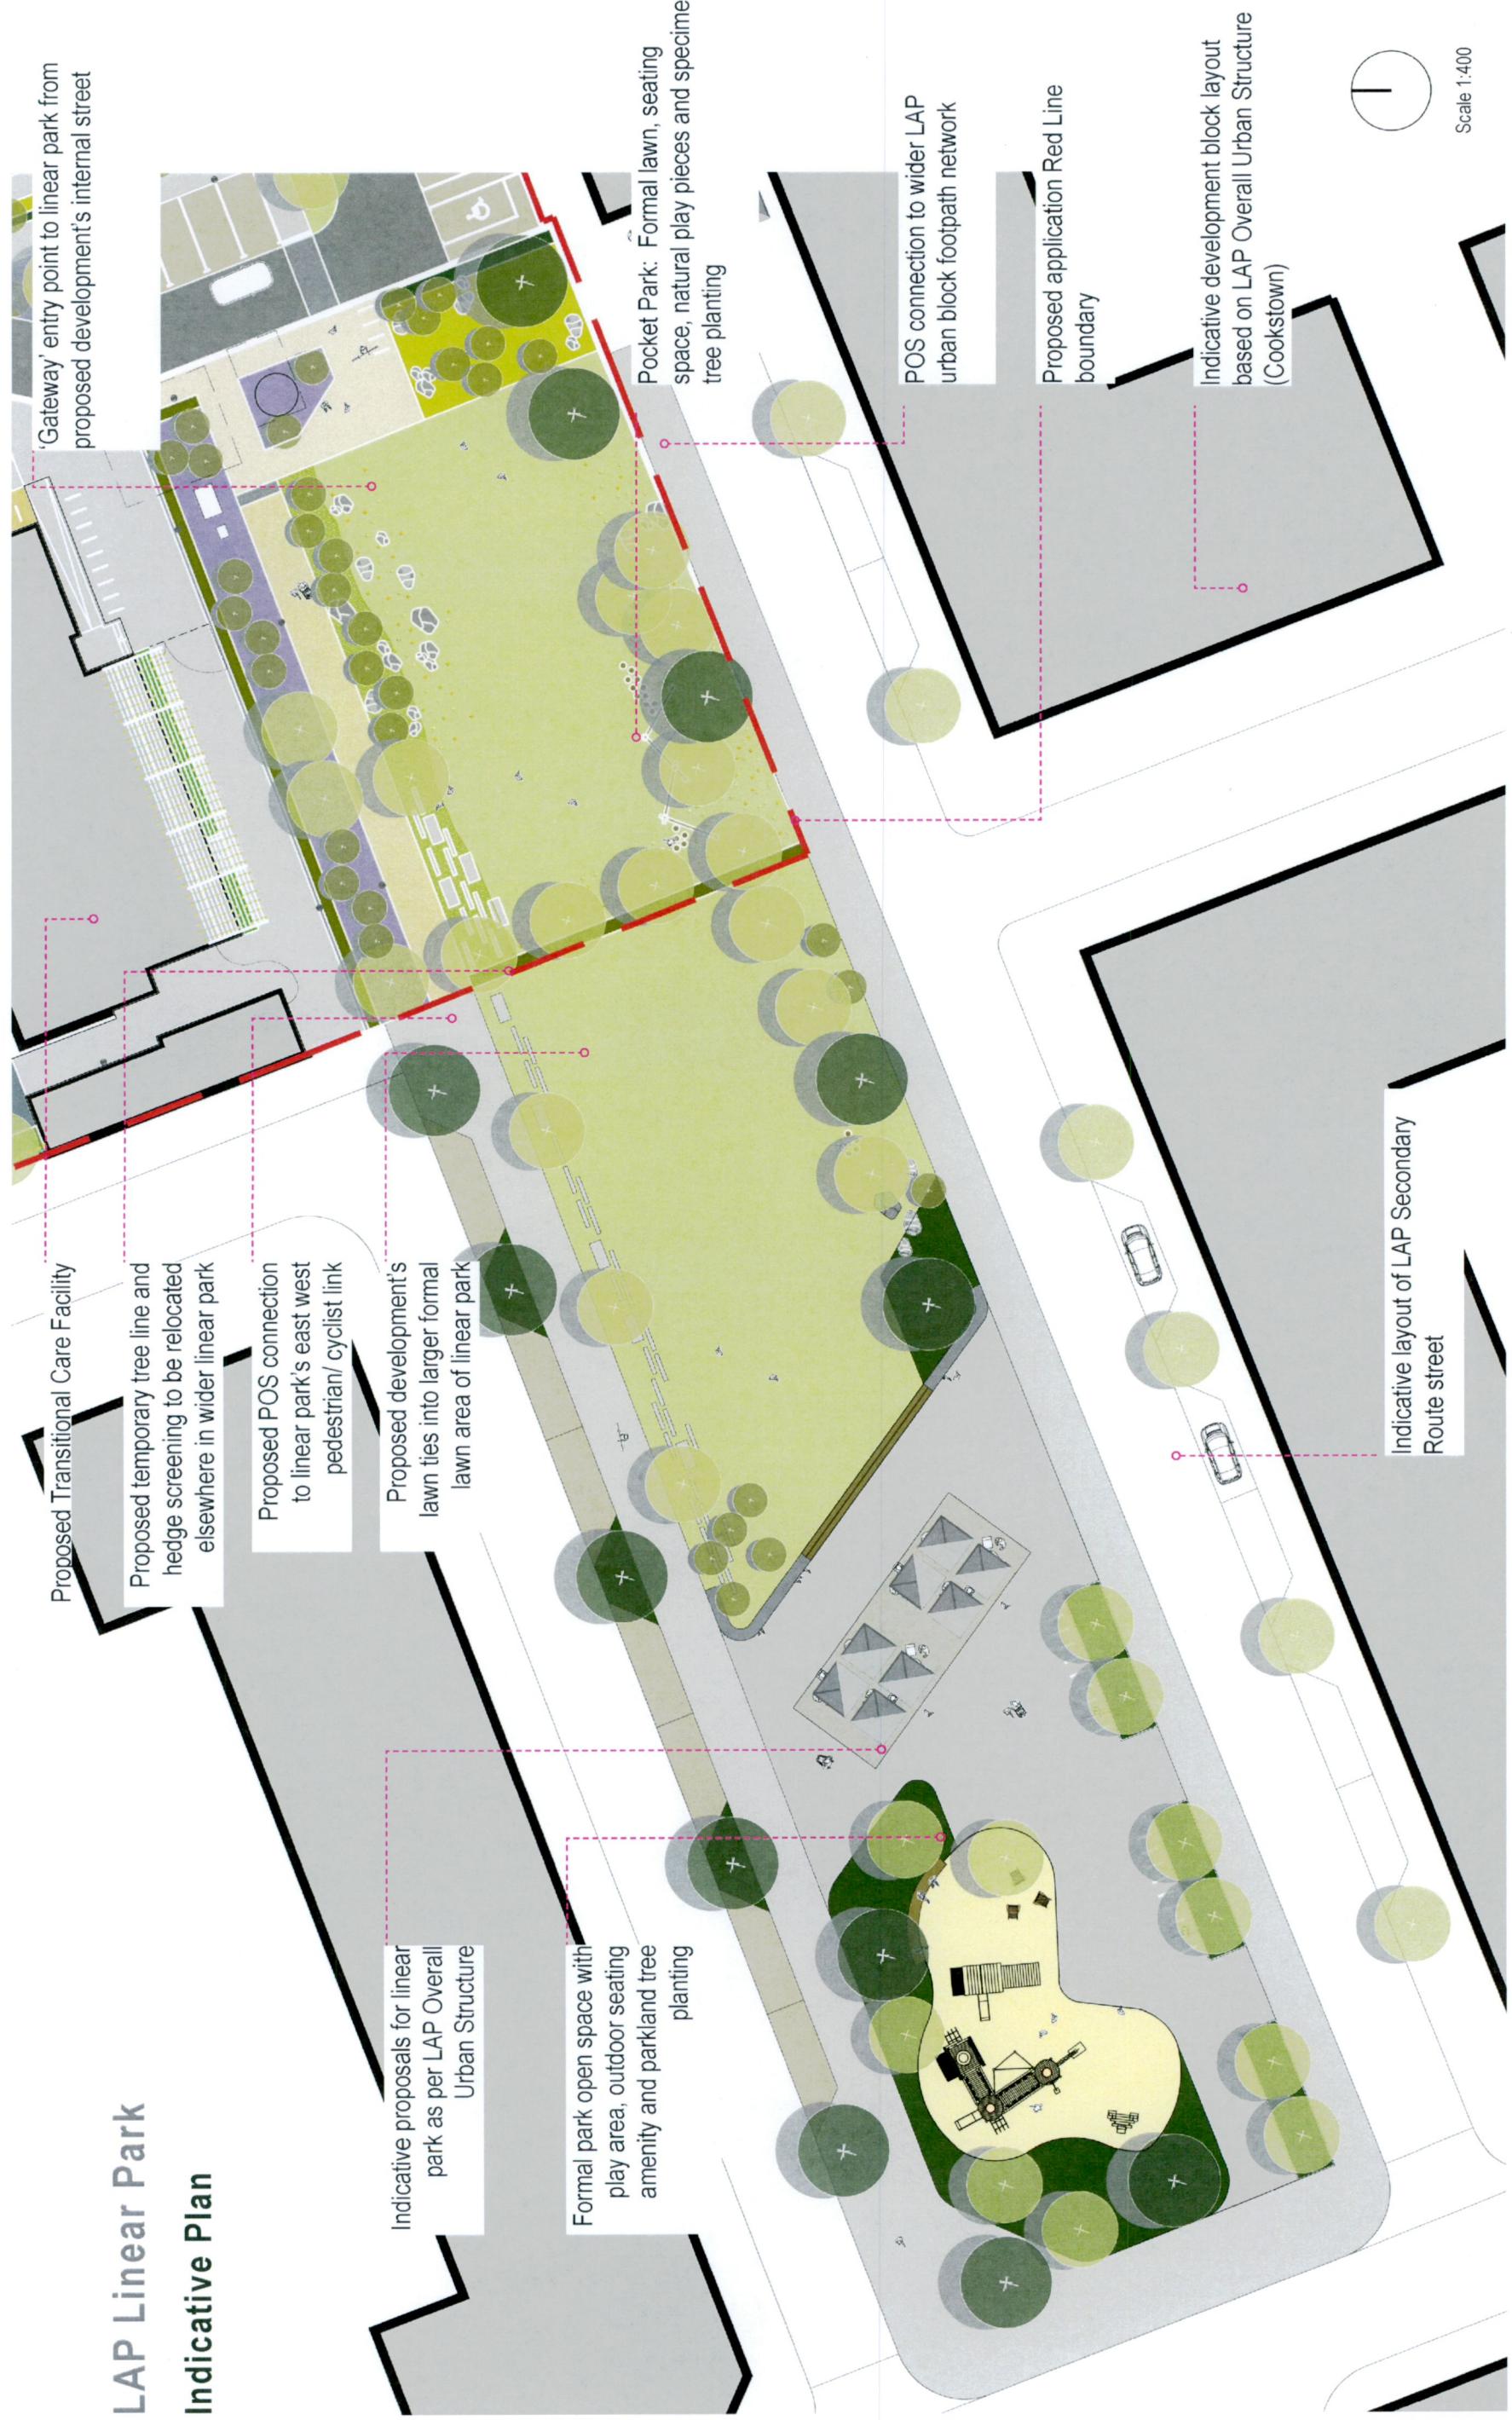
Local Area Plan - Indicative Pocket Park Sketch Plan
